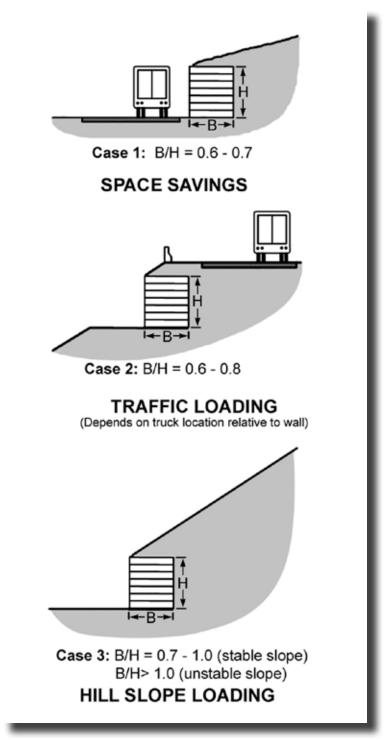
Typical wall width-to-height ratios for different retaining wall loading conditions (Source: State of California Department of Transportation).
